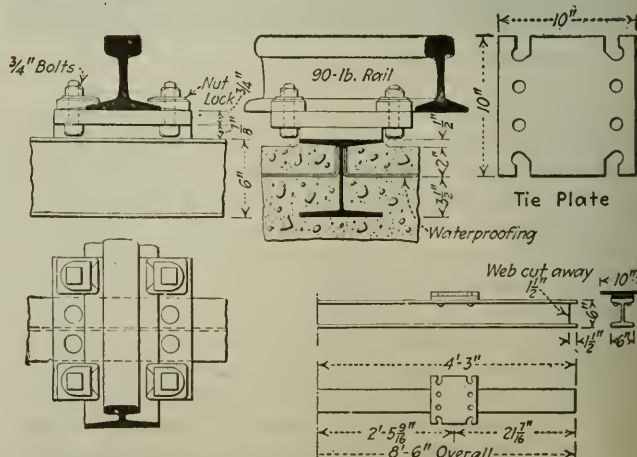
RAIL FASTENINGS ON BRIDGE FLOOR
